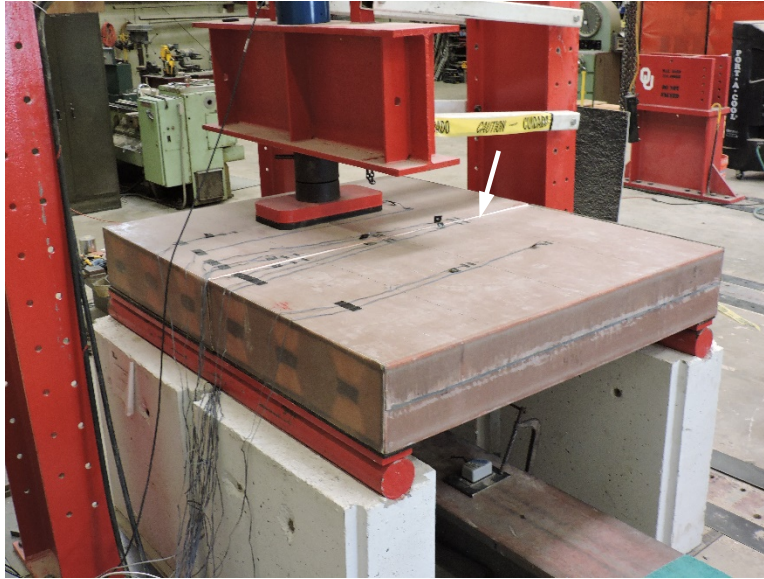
Panel-to-Panel Connection Test Setup for FRP Deck Specimens
